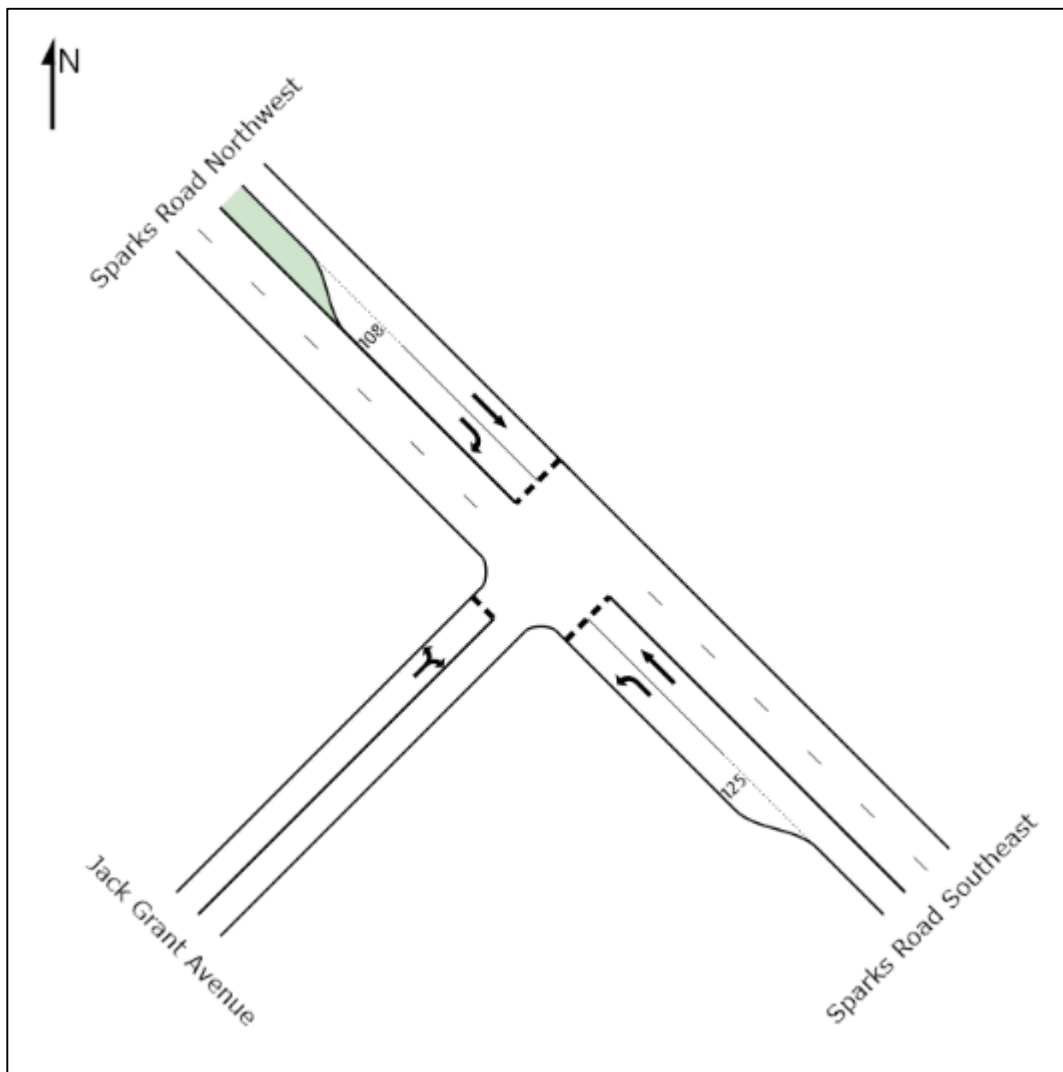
Intersection Layout on Sparks Road and Jack Grant Avenue intersection
